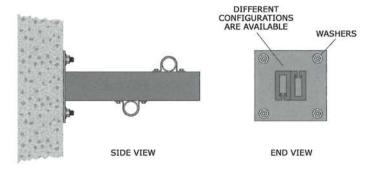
Attachment to the wall with angle or strut welded to attachment plate.
